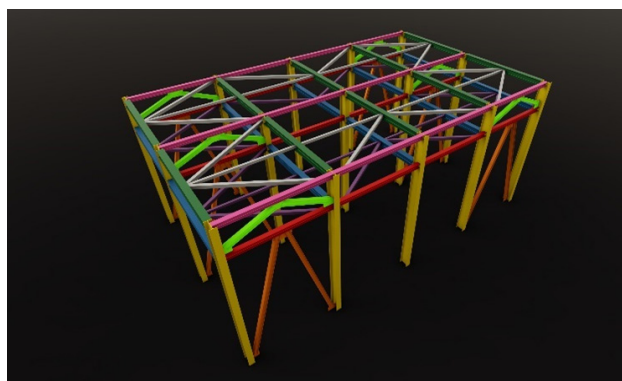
Display of Section Grouping in Steel Pipe-Rack Example 2
